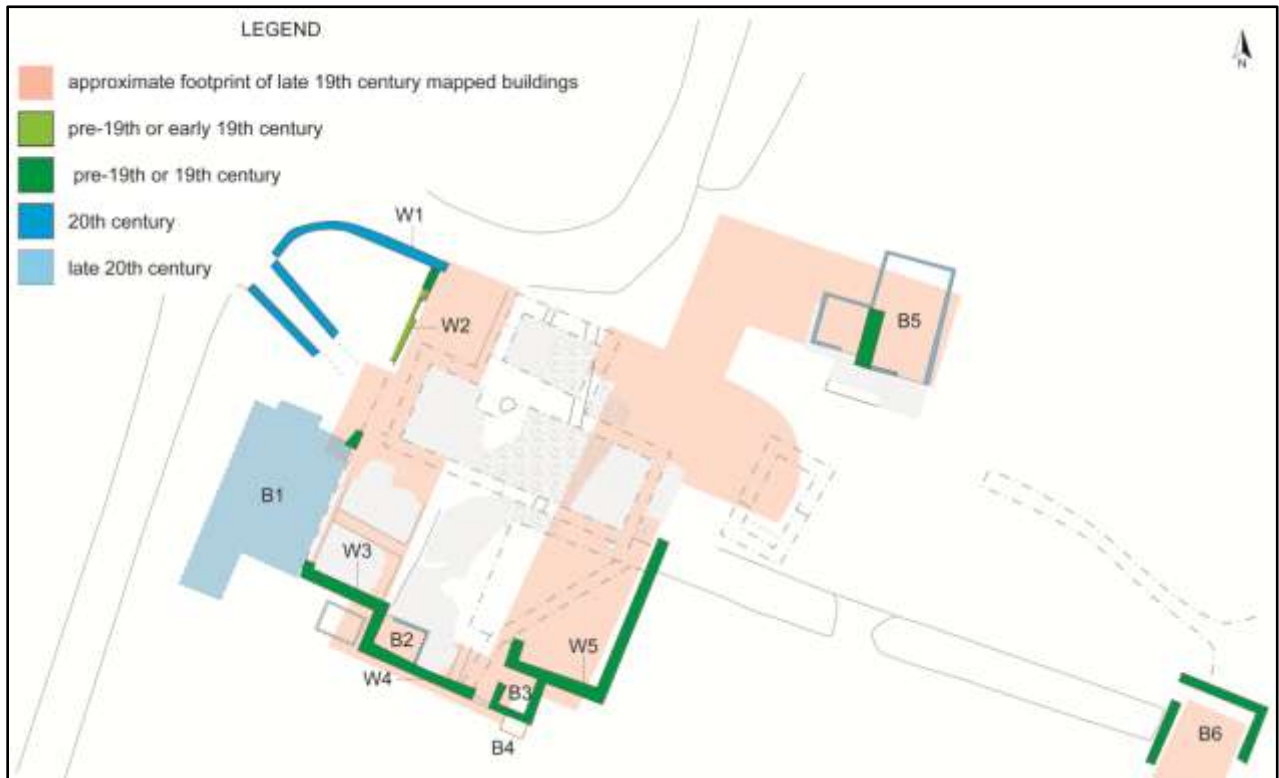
SITE PLAN SHOWING LOCATIONS OF BUILDINGS AND WALLS DESCRIBED.
